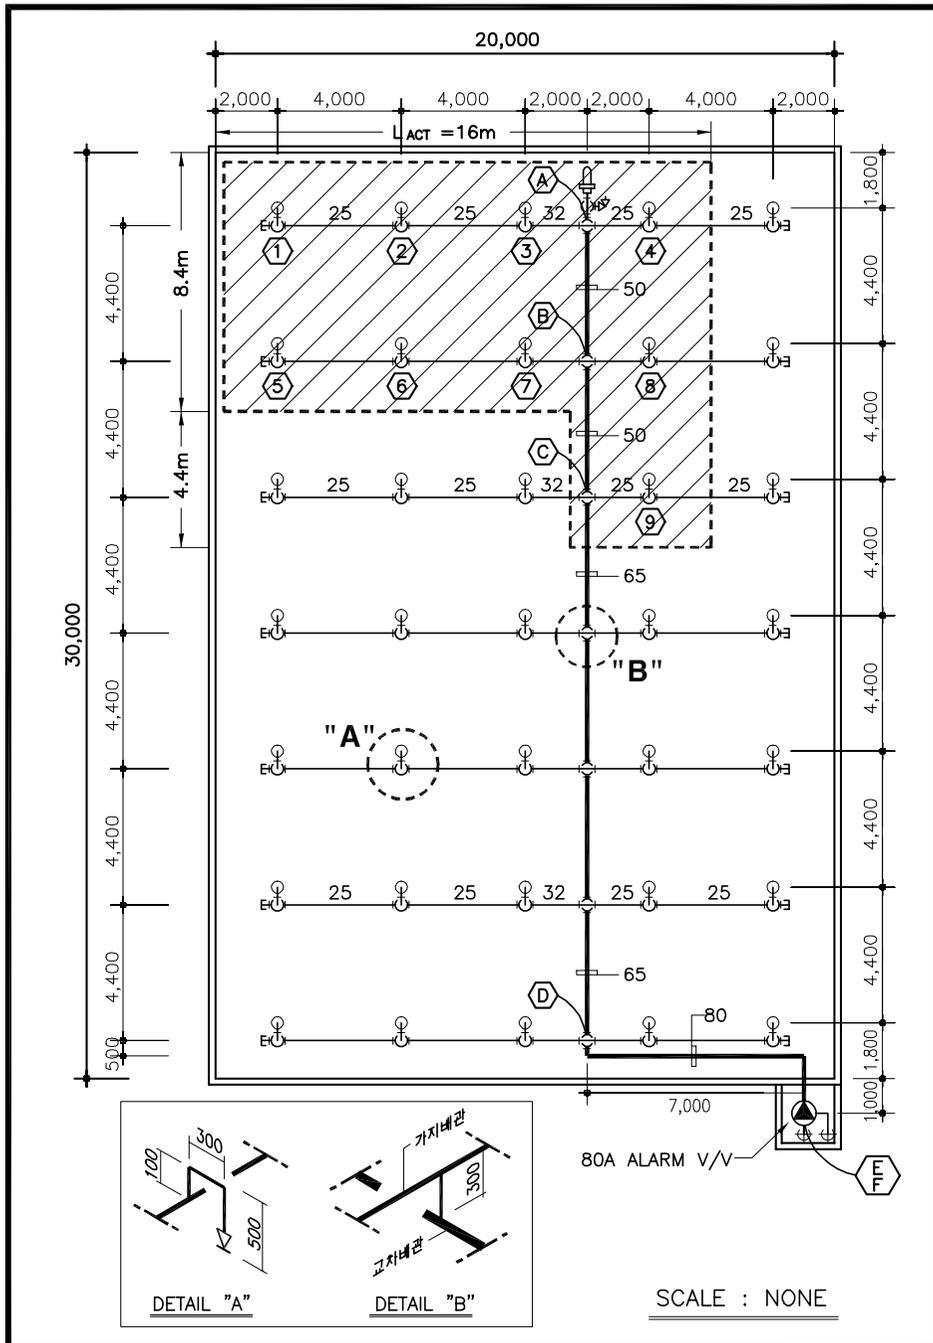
Plan View of Hydraulically calculated Sprinkler System
